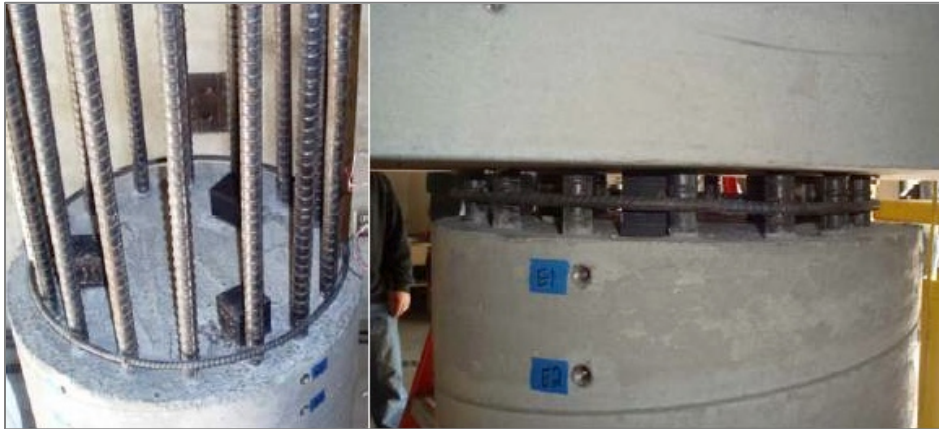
Cyclic Column Ductility Test. Concrete Filled Corrugated Metal Pipe Column to Cap Connection (Source: NCHRP Project 12-74 [35]).
